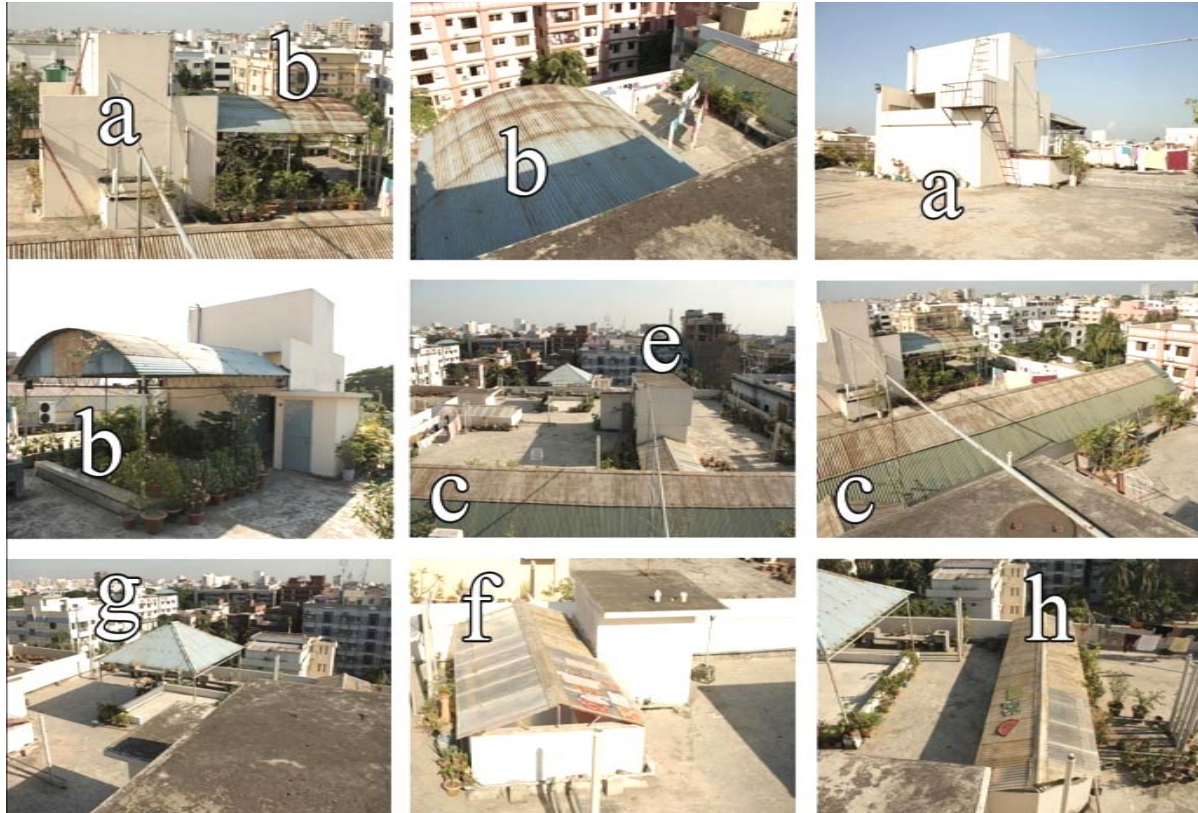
Partial Roof Photo of House no. 63 (Dhanmondi Road no. 8/A)
